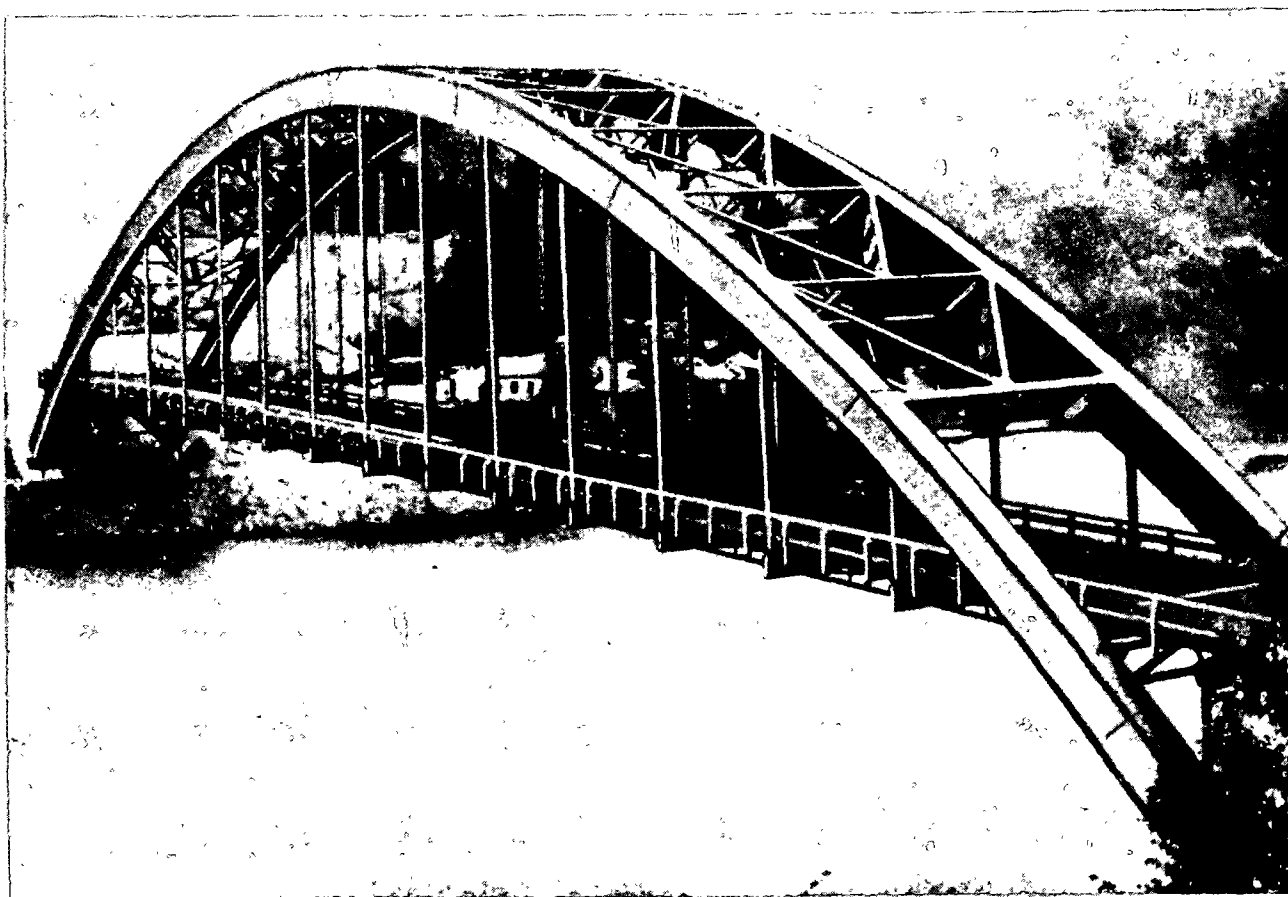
Parallel curve, steel rib, arch bridge.
